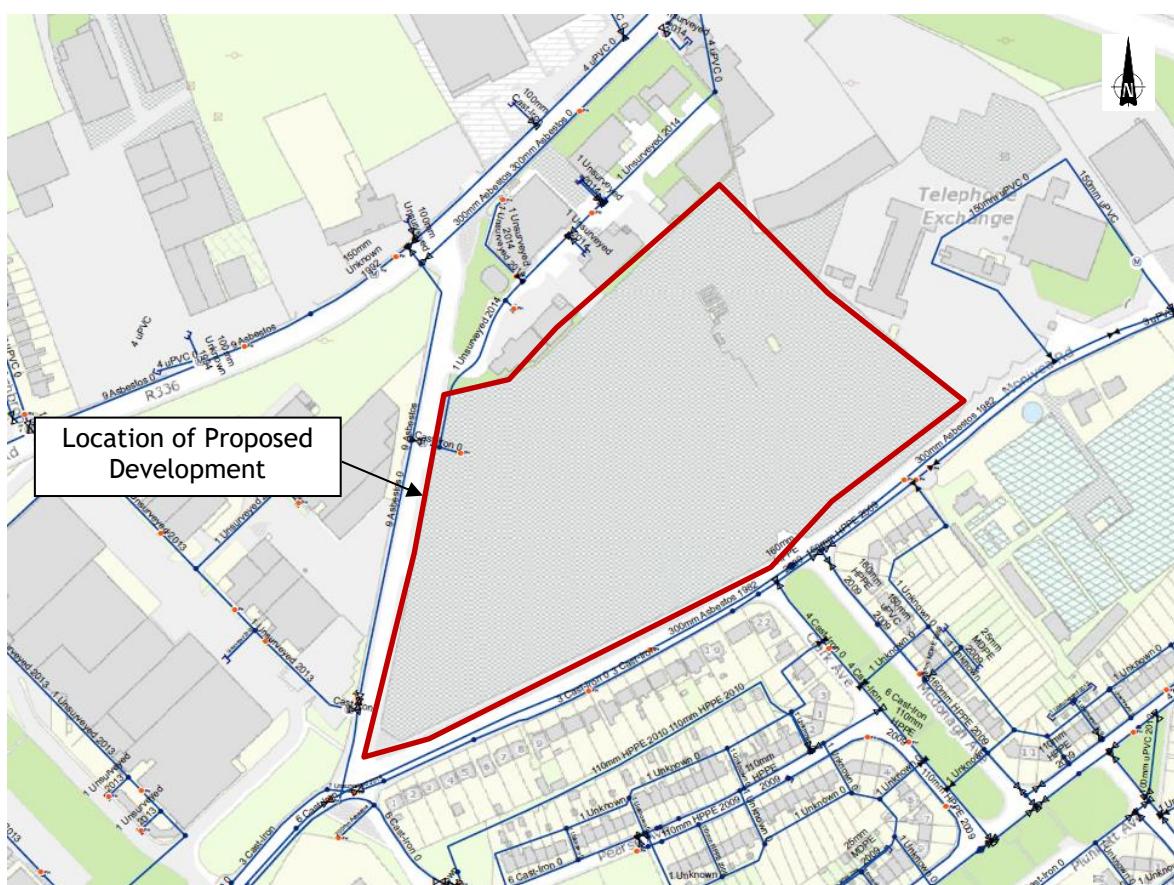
Existing Watermain Surrounding Site (Source: Irish Water Record Drawing)
